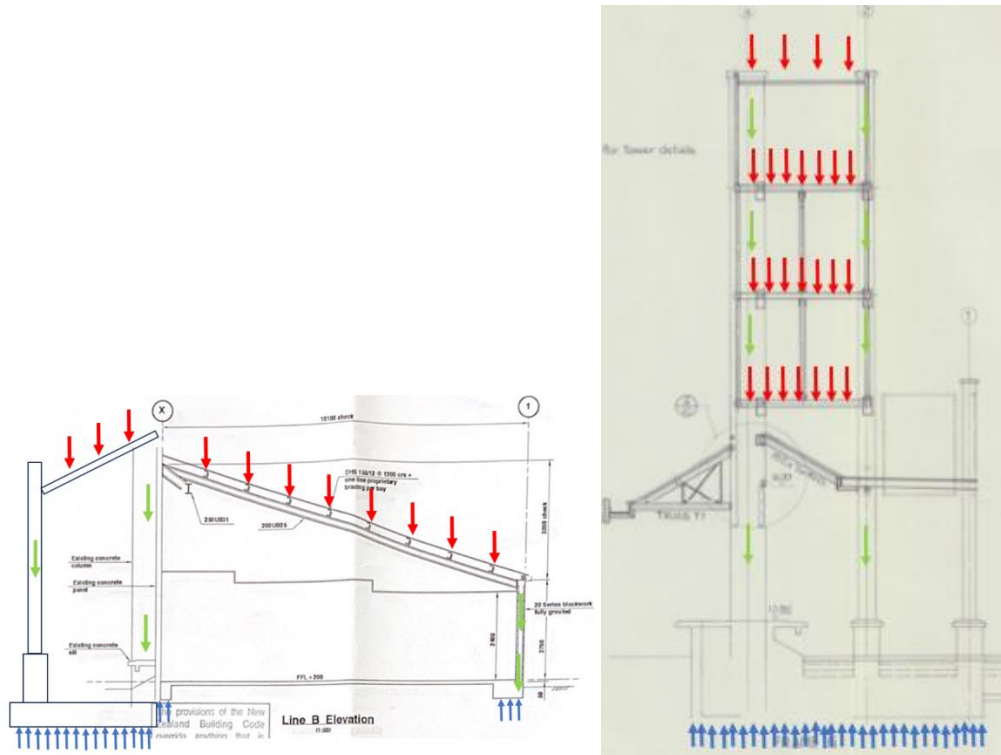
Typical Gravity Load Path Diagram to the Rest Room and Canopy (LHS) and Clock Tower (RHS)
